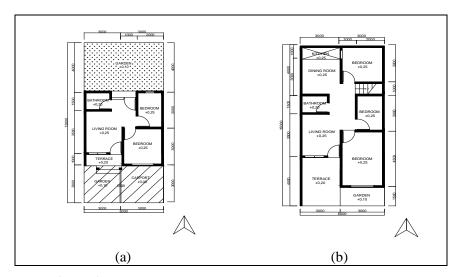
(a) LS house plan in 1997, (b) LS house plan in 2002
